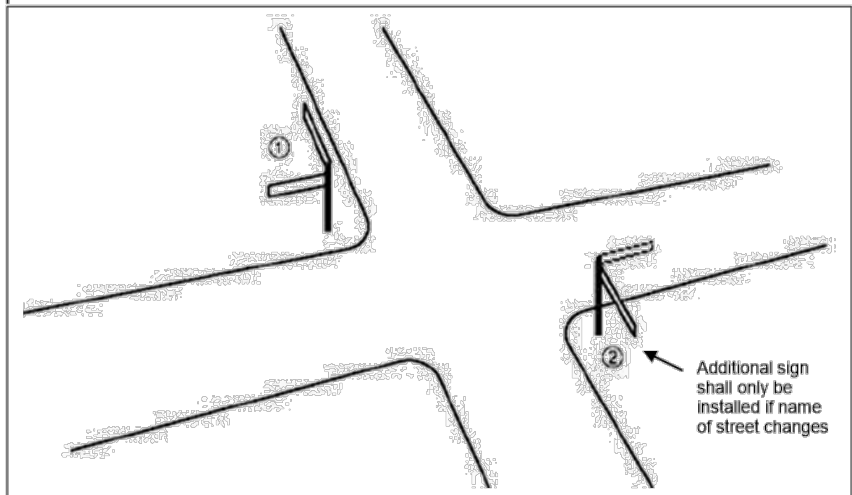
INTERSECTION OF MINOR STREETS
